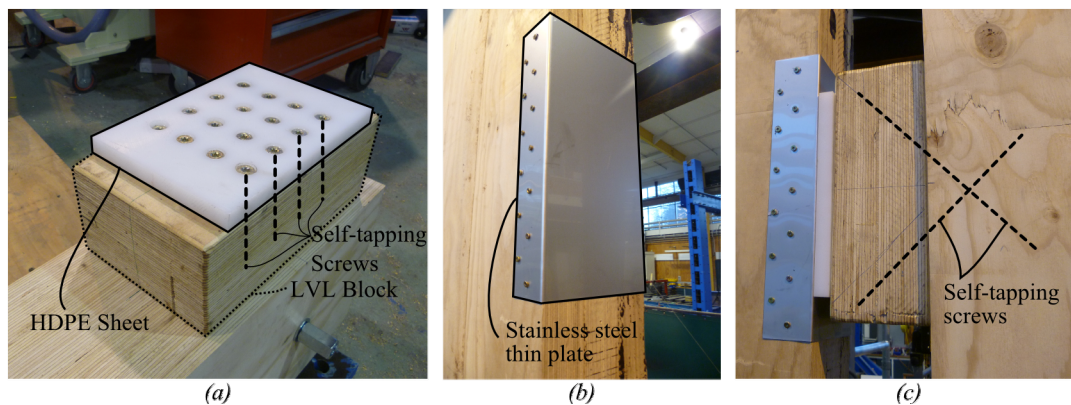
Shear transfer device. (a) LVL and HDPE block on the column; (b) Stainless steel sheet on the wall side; (c) the finished setup.
